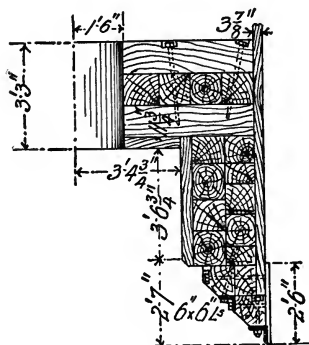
Detail of Caisson Cutting-edge, Gillender Building.
